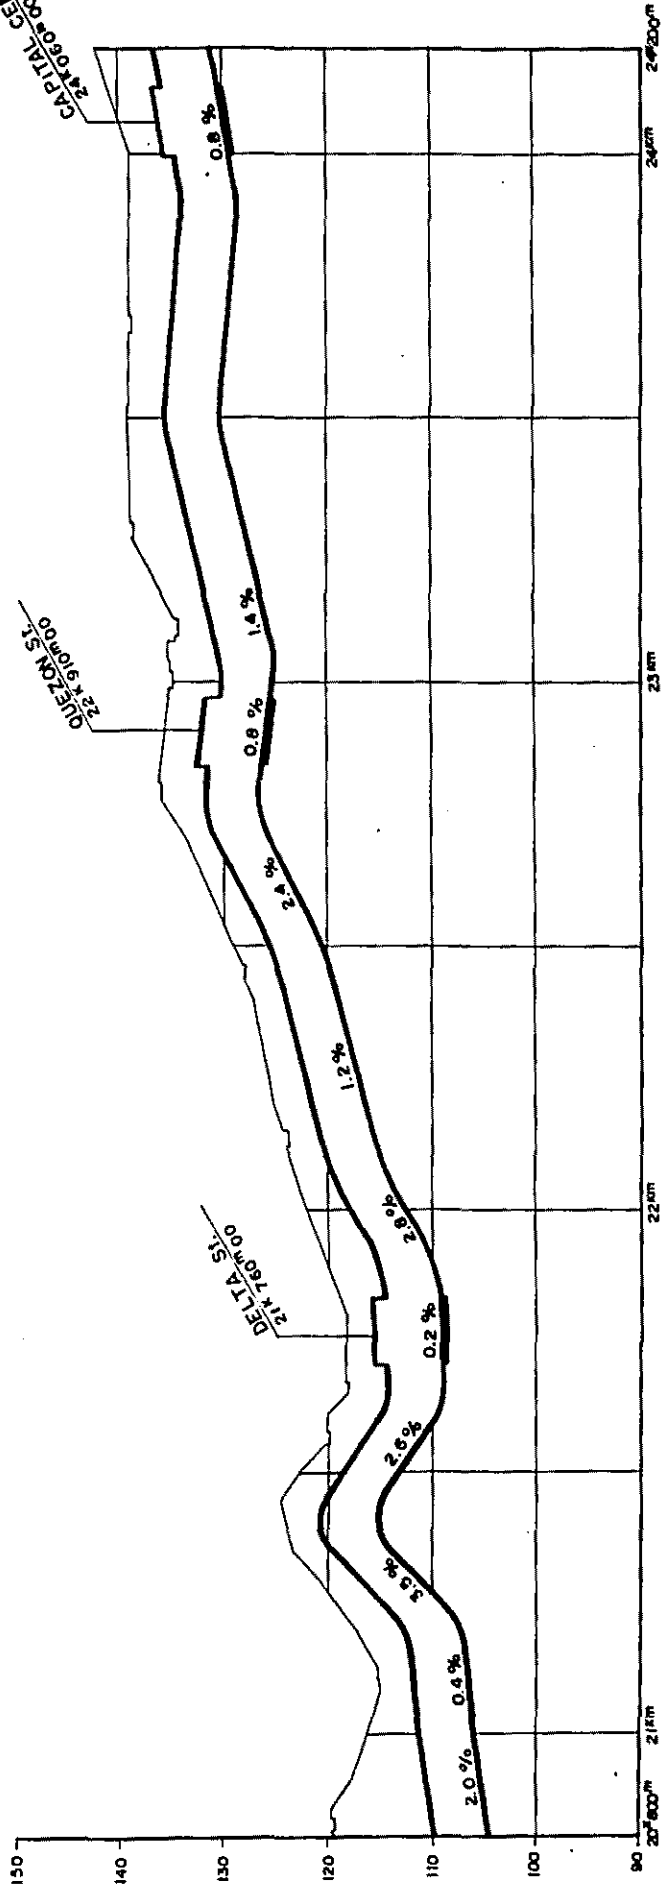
Plan and Profile for All Underground Alternative (2)
